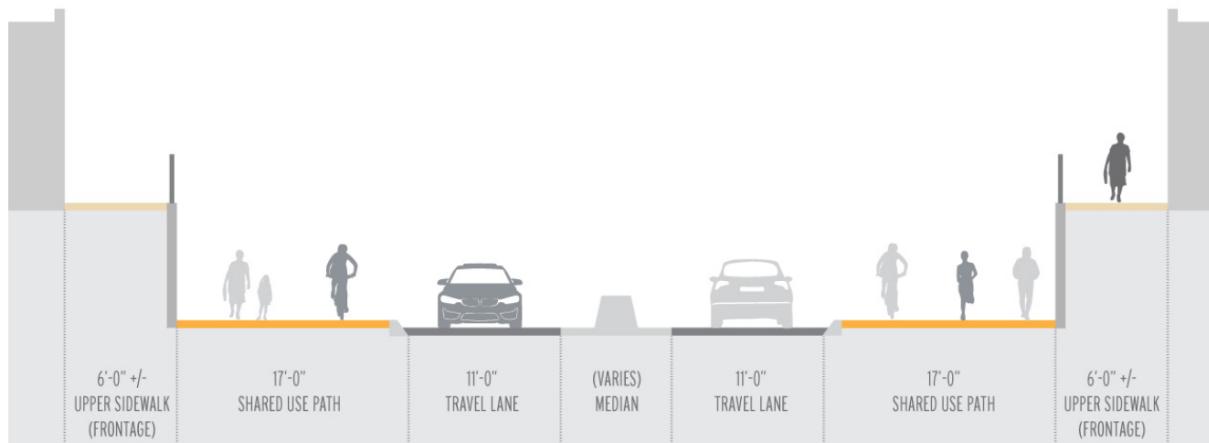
Greenwood Avenue Concept 1: Cross Section B
